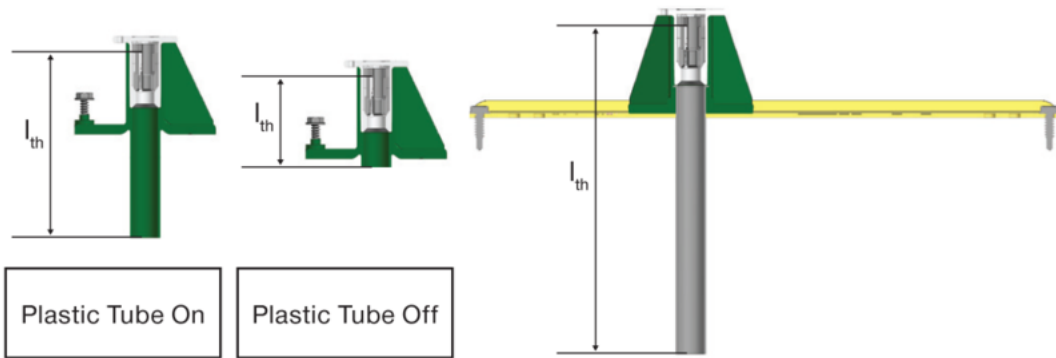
KCC-MD and KCCM-MD thread engagement measurement
